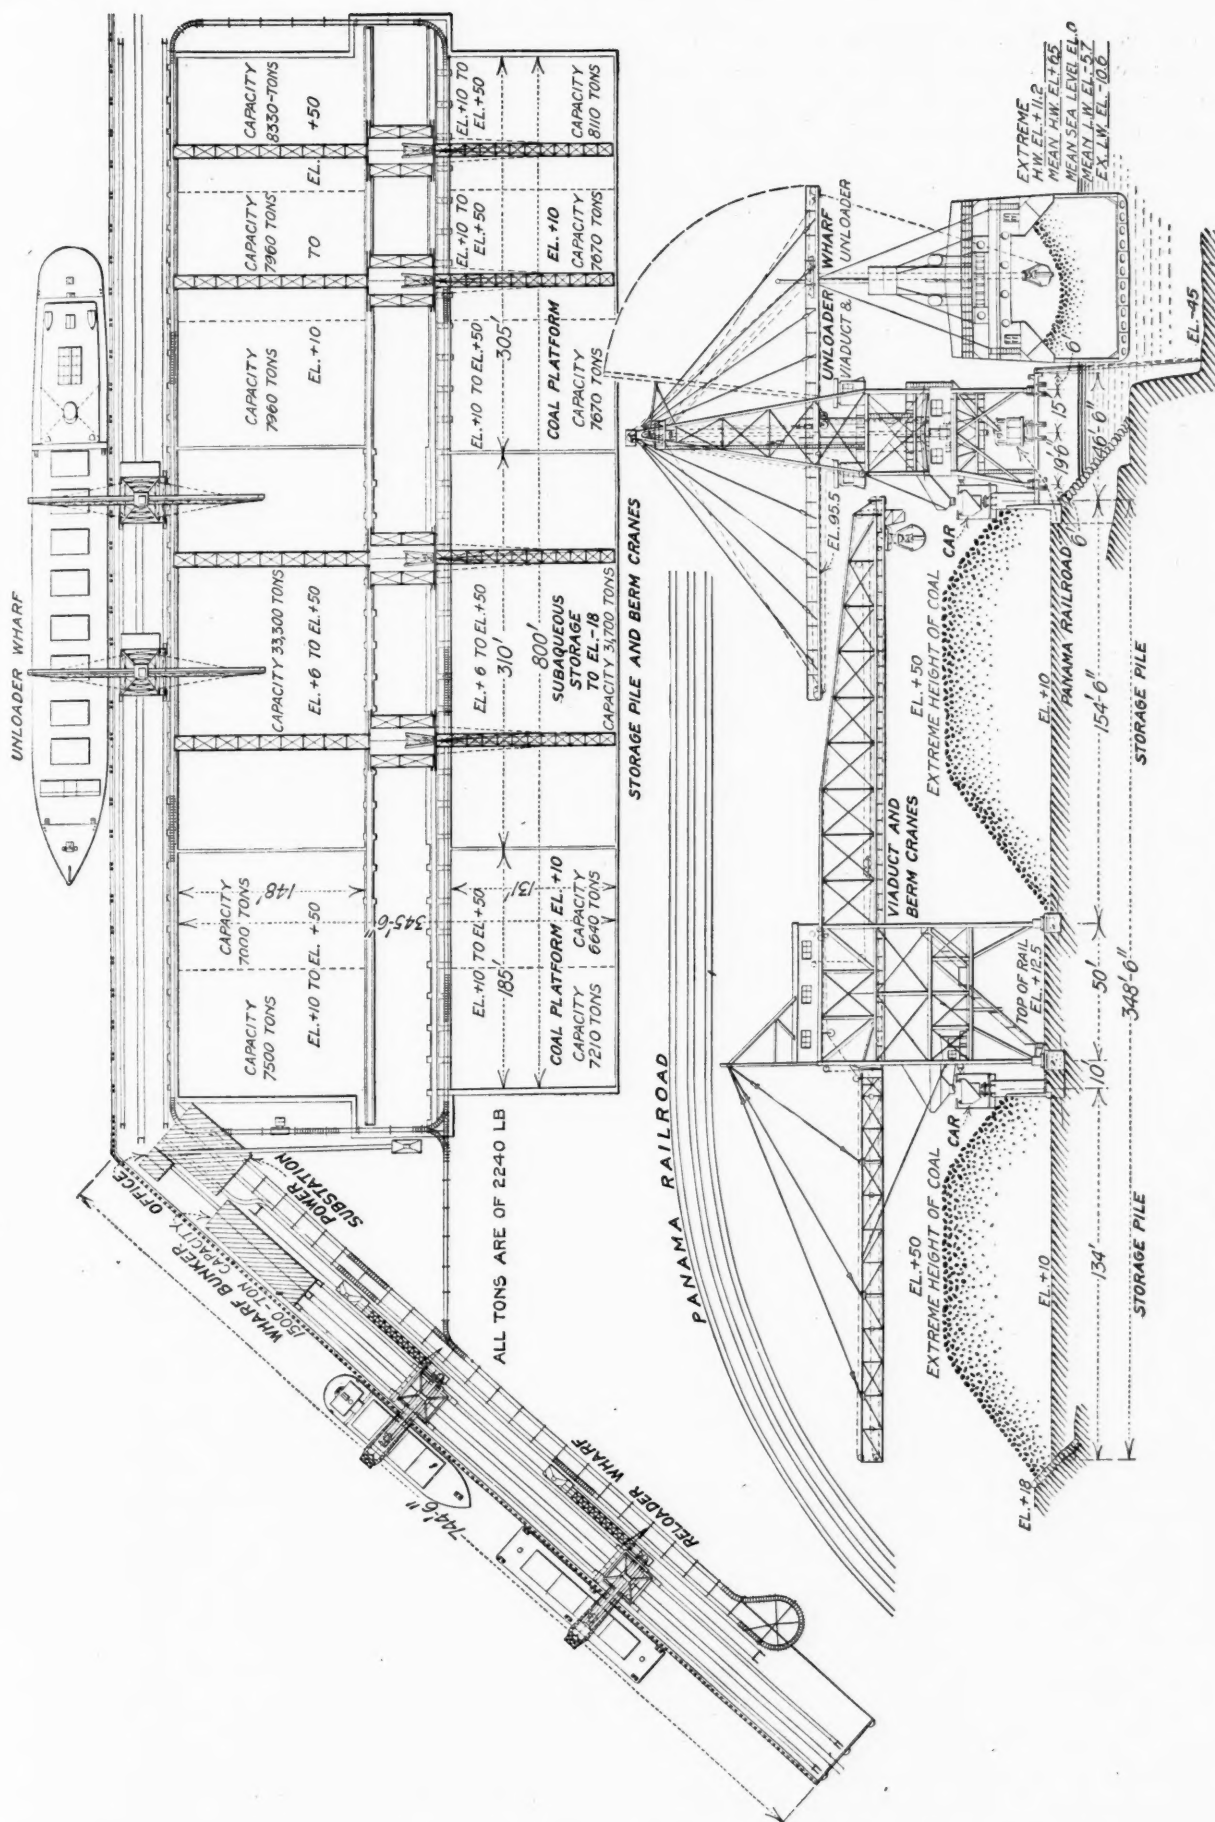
PLAN AND SECTIONAL VIEWS OF COAL-STORAGE PLANT AT BALBOA, PANAMA CANAL
